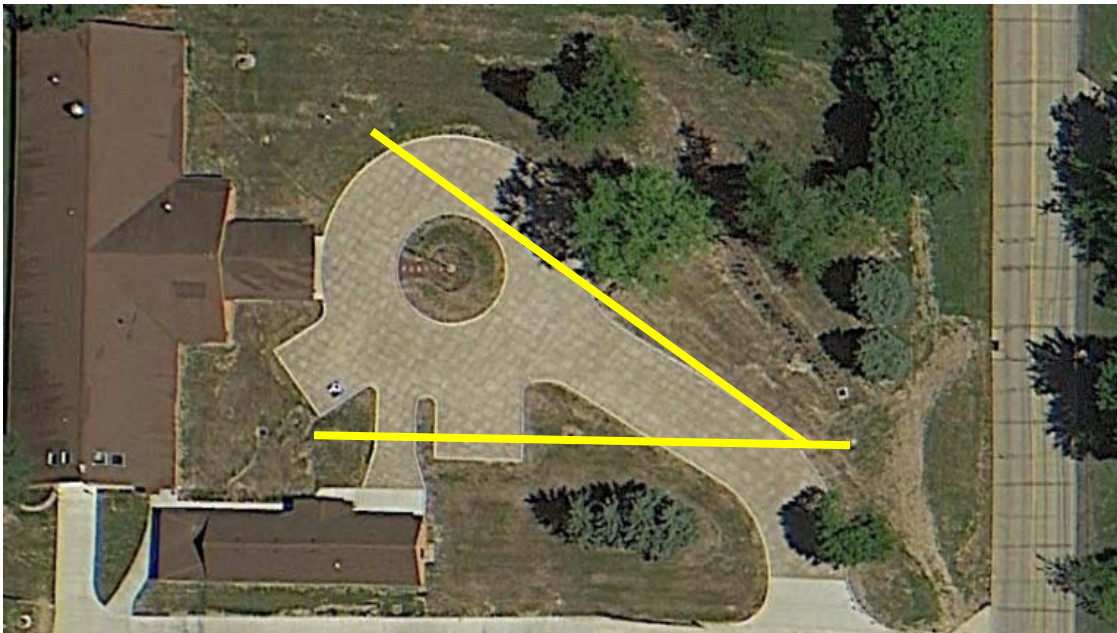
Plan view of the PICP parking lot at the Orange Village recycling facility. Note that the entire lot is PICP, with no run-on from impermeable pavement. Locations of the curtain drains are shown in yellow. Photo credit: Google earth.
